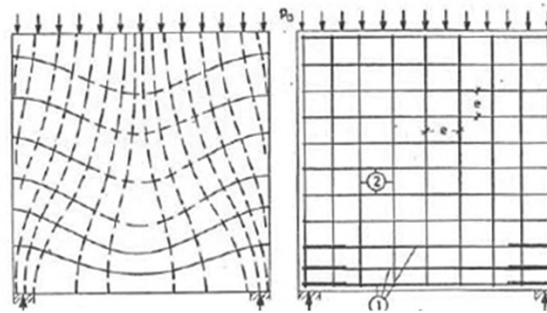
Check control reinforcement spacing when a crack is cracked with
